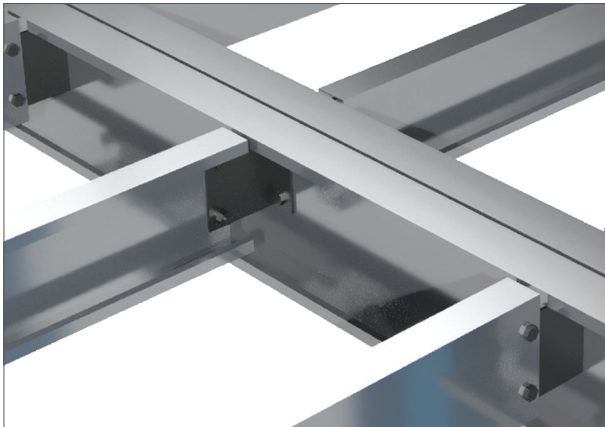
Detail of floor beam inset connection to a girder of thin-walled C+ section
